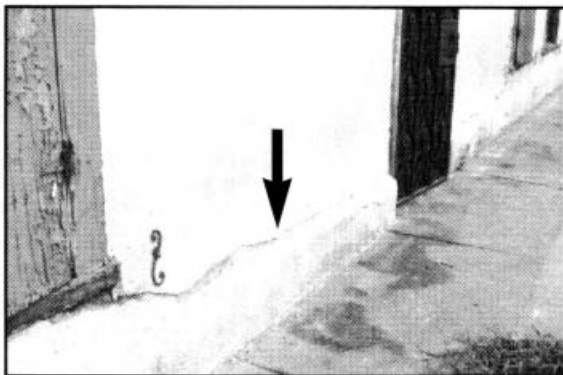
Crack at the base of the west wall caused by combined out-of-plane rocking and slumping.
